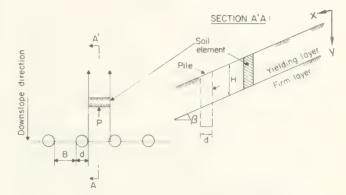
State of plastic deformation and soil arching action around a row of piles (trees) embedded in a slope (from Wang and Yen 1974).
